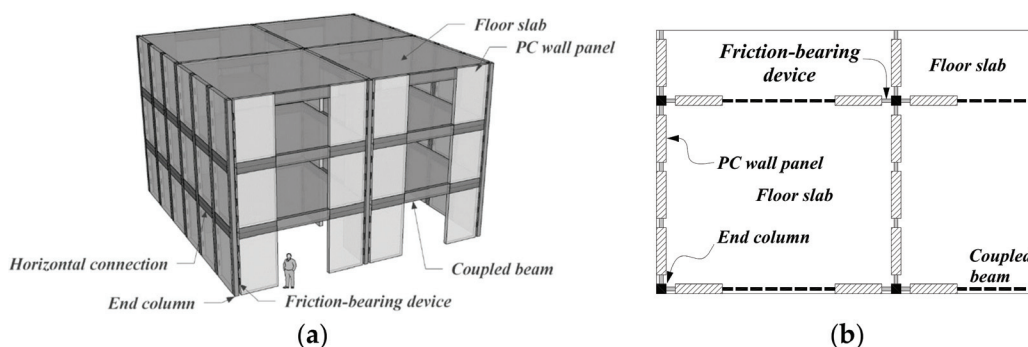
Proposed PC shear wall system [22]. (a) 3D view; (b) Plan view.
